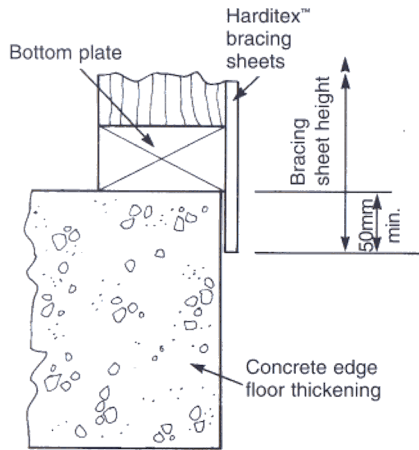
HARDITEX™ GROUP NAIL FIXING FOR CONCRETE FLOORS
